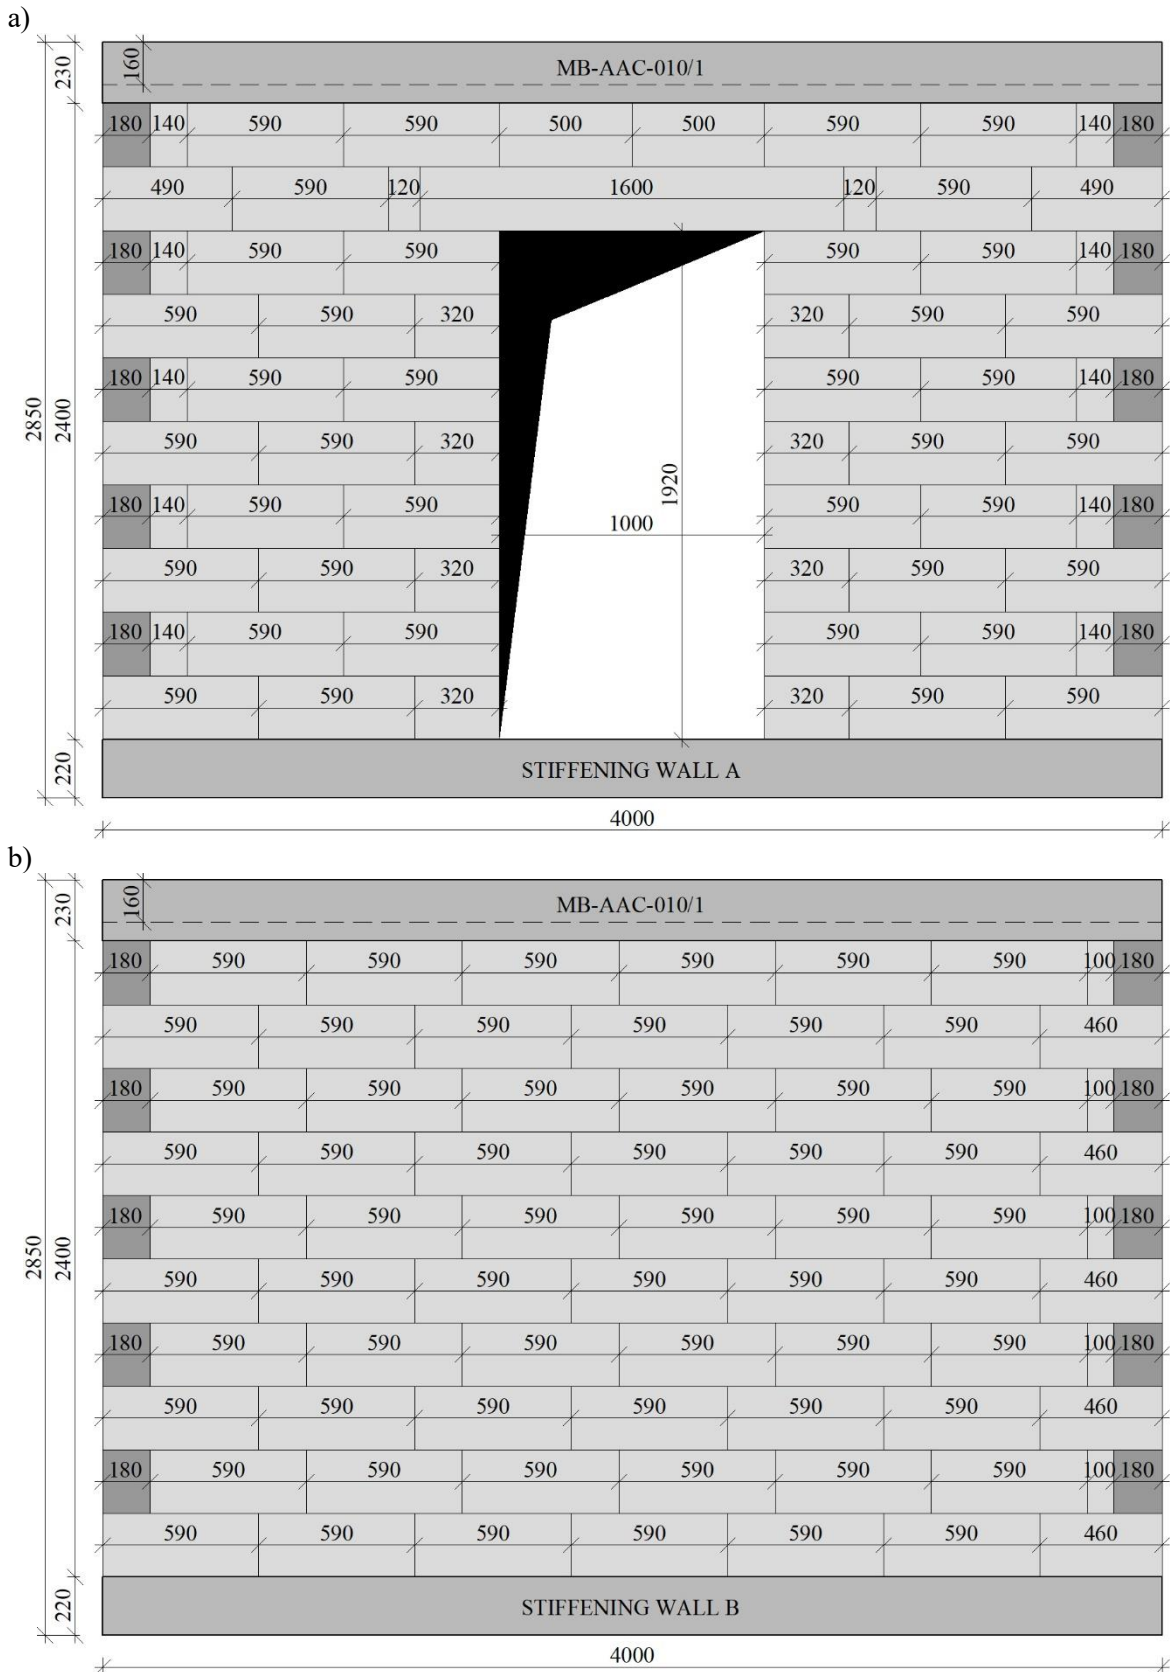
Design of the MB-AAC-010/1 model: a) stiffening wall A, b) stiffening wall B
